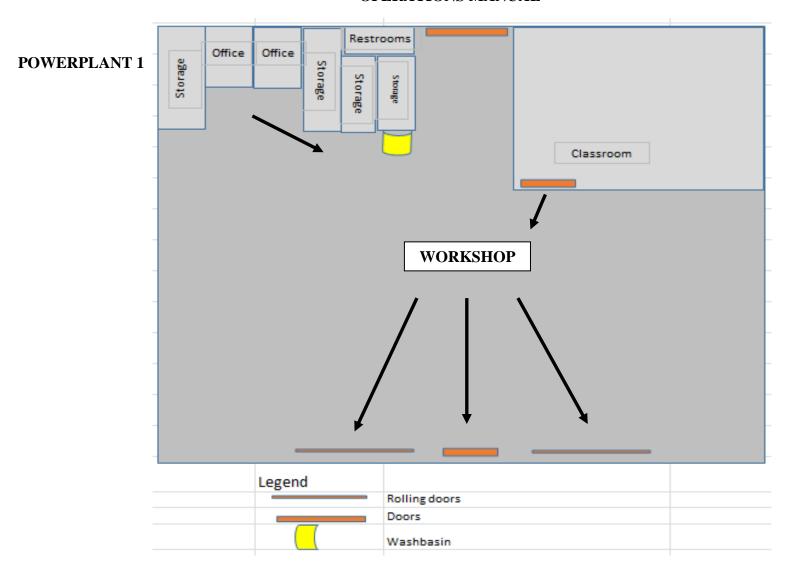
Emergency Exit Plan, Building D-2, First floor Powerplant Classroom (D - 101)
